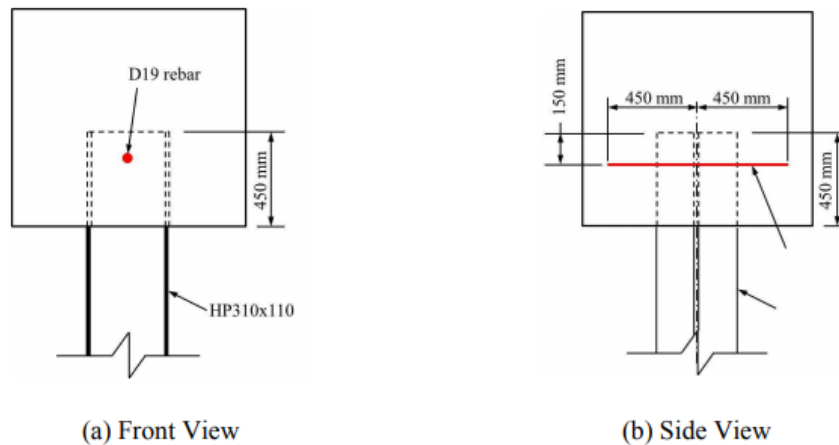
PennDOT rebar detail.* (Lee, Kim, & Jeoung, 2013)
